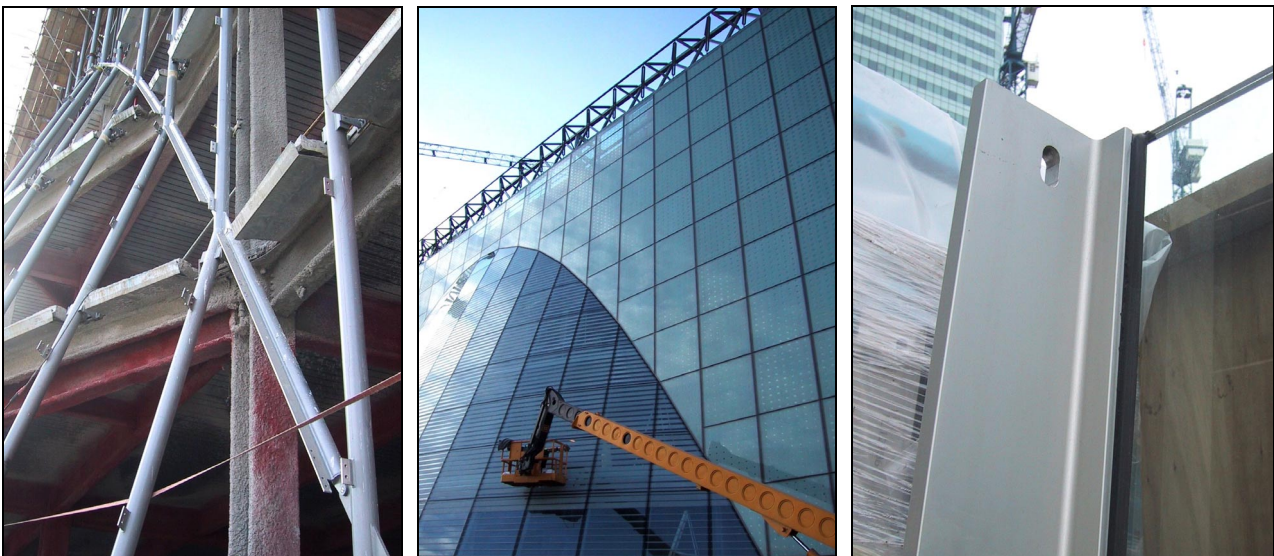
Example of a structural silicone glazing façade, main sub-structure mullions before glazing (left); finished façade (center) and anodized aluminium carrier-frame (right) [1]
